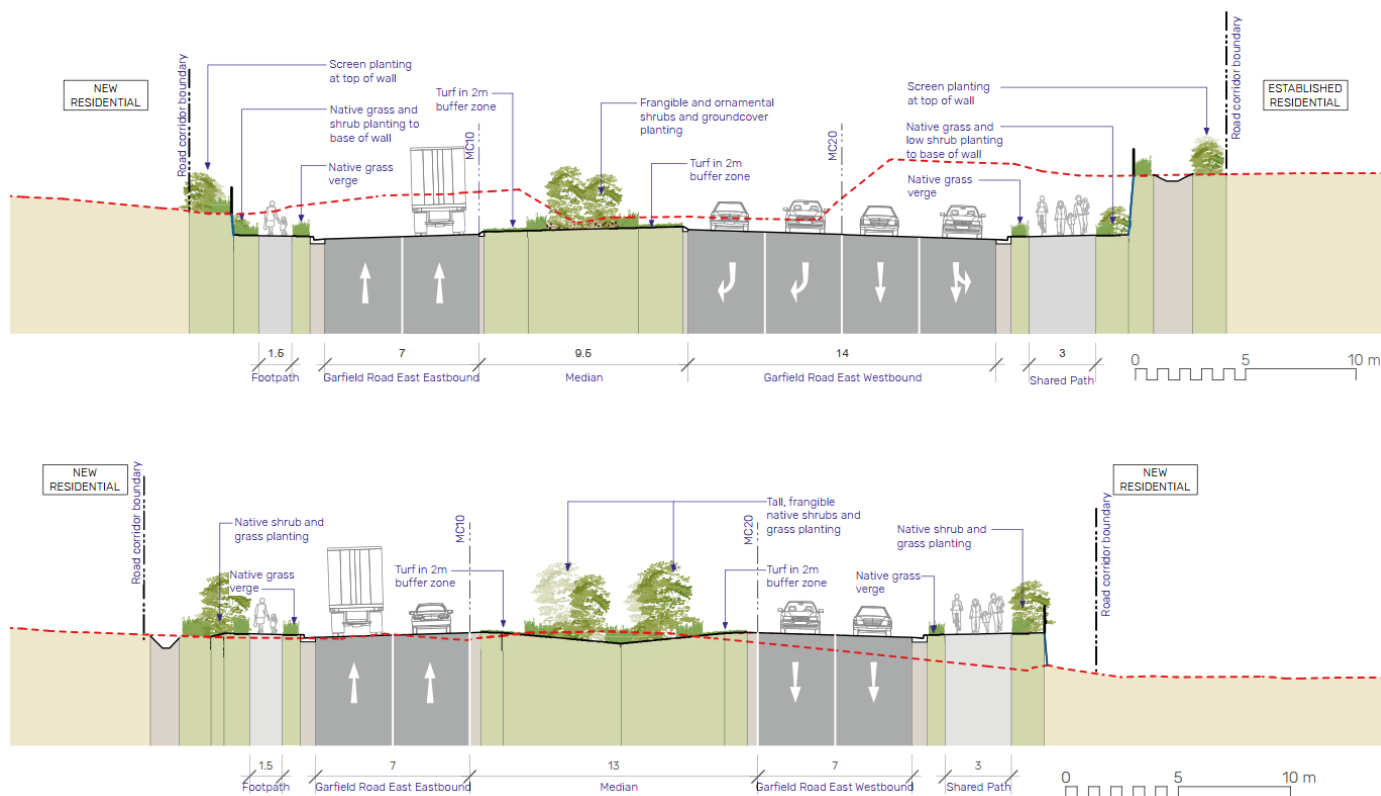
Typical cross-section of the proposed Garfield Road East at chainage 1200 and 1700 (source: SMM, 2020)
